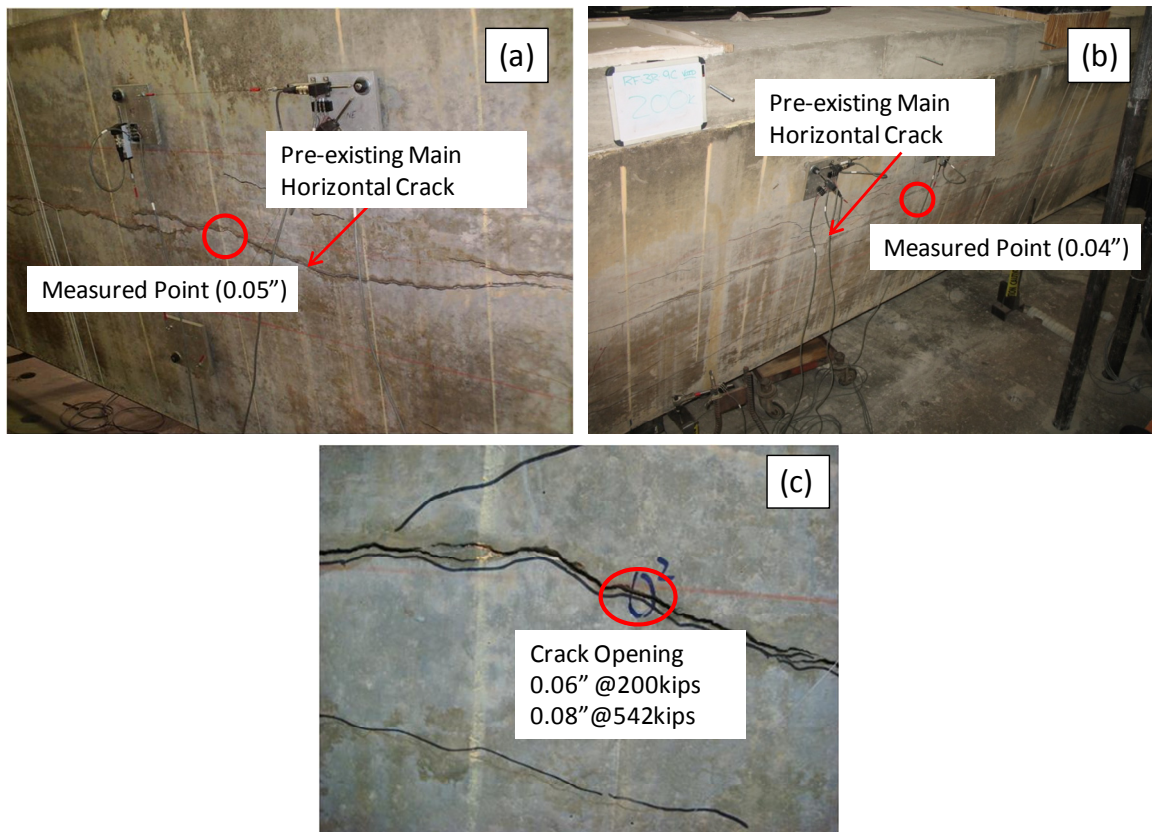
Horizontal cracks (a) East side (b) West side (c) Crack opening on east side
